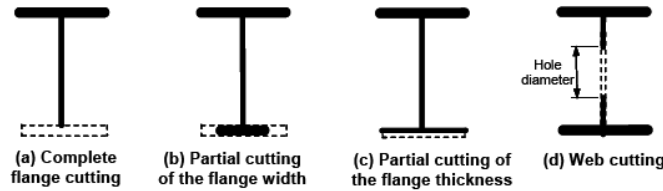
Various techniques of introducing artificial damage to steel girders
